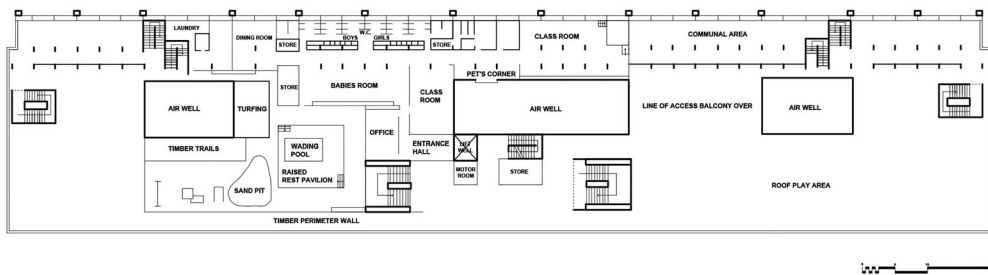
Typical third-floor plan of the Park Road development showing recreational areas for residents (drawing by Lin Derong).
